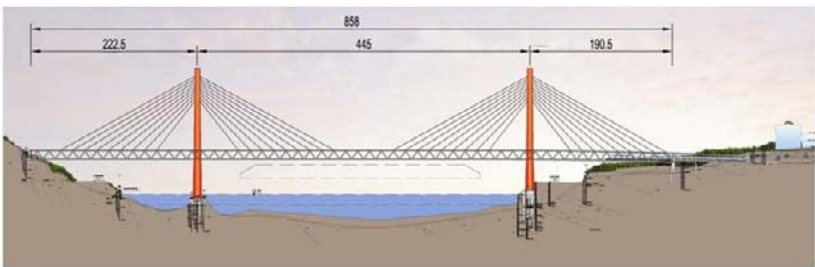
Rendering of Dongshuimen Yangtze River Bridge (m)
